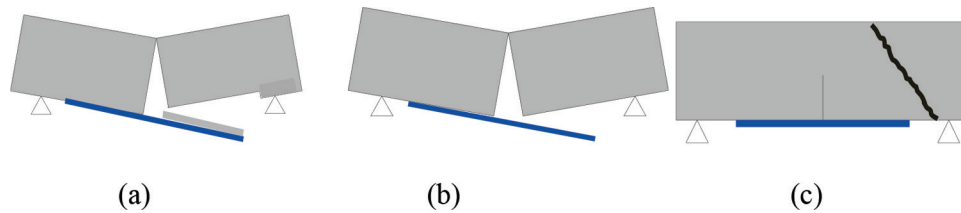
FRP concrete failure modes: (a) cohesive failure mode; (b) adhesive failure mode; and (c) shear failure of concrete block.
